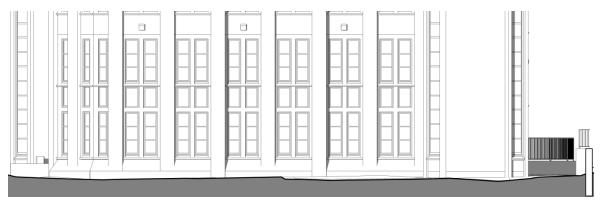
Existing north-west elevation Sir Cyril Taylor Library, at ground floor level.
